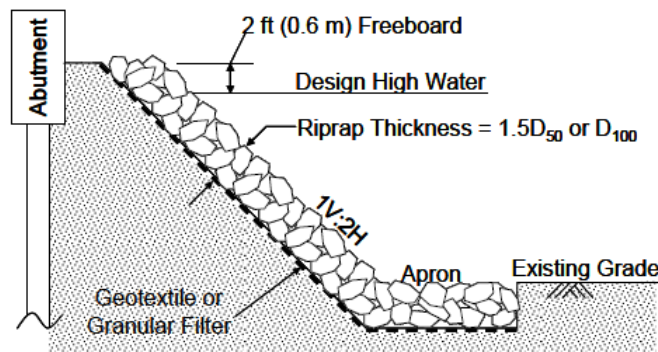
Typical cross section for abutment riprap, from FHWA HEC 23, Volume 2, Figure 14.8
